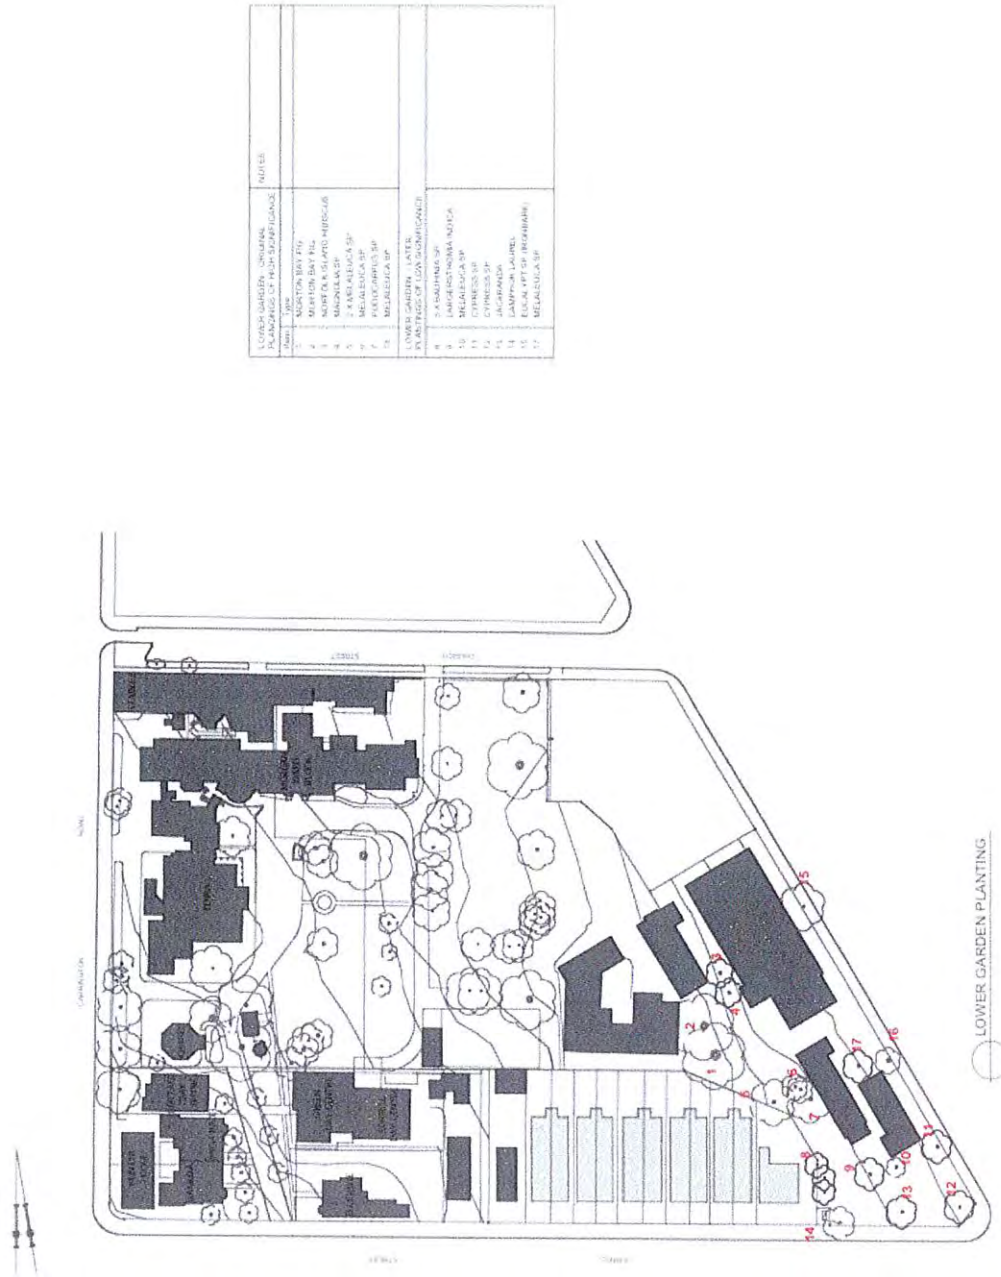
Site Plan showing landscape elements – Lower Garden
